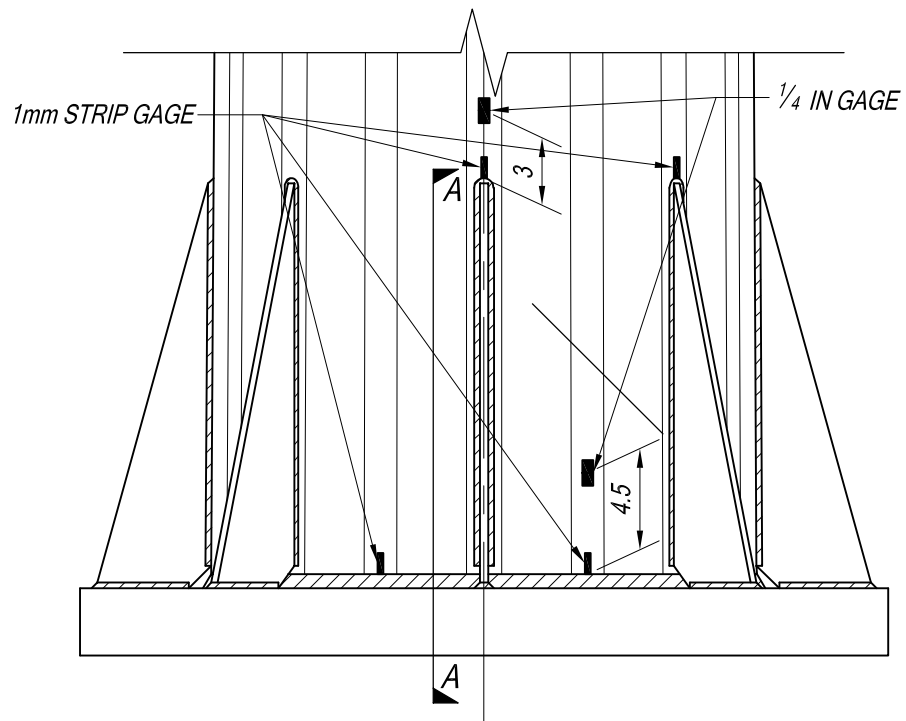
Type XII specimen elaborately instrumented specimen strain gaging plan
